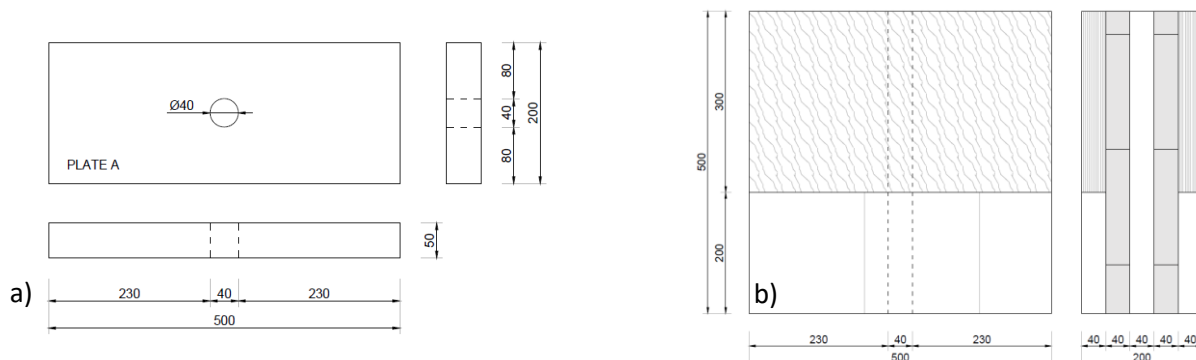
a) Steel anchor plate; b) CLT horizontal element reinforced with LVL made of beech
